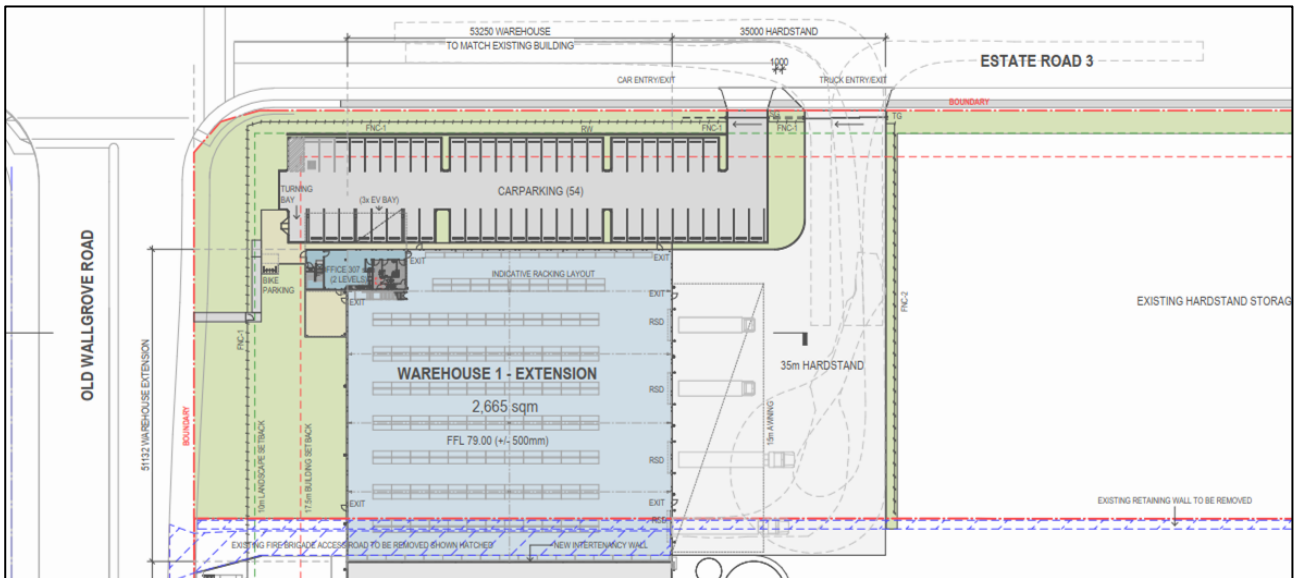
Proposed SSD Site Plan for the Precinct 1 Expansion
